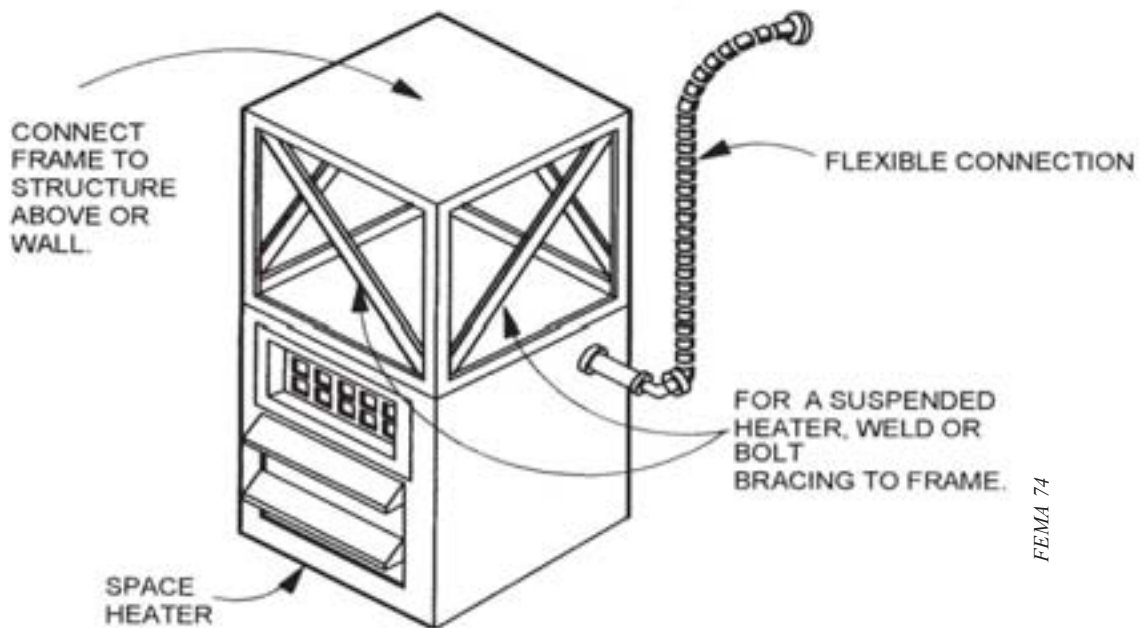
Prevent suspended equipment from falling with proper connections and bracing.
